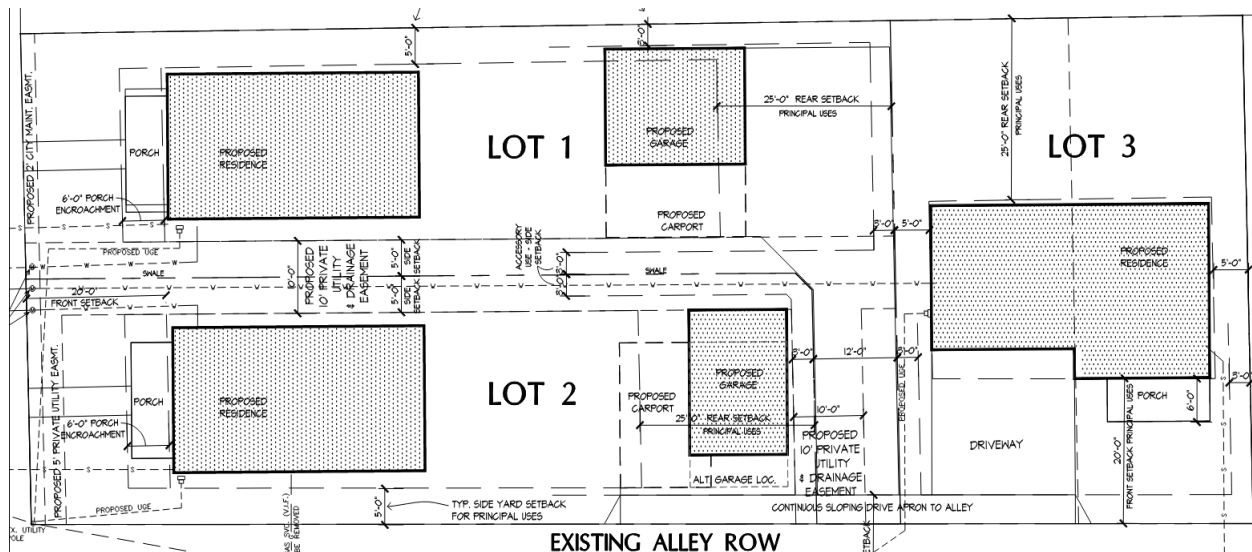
Conceptual site plan of three single-family dwellings, one per lot. The conceptual configuration complies with Old Town Overlay zoning standards. This conceptual site plan is illustrative only and is not part of the requested minor subdivision approval.
